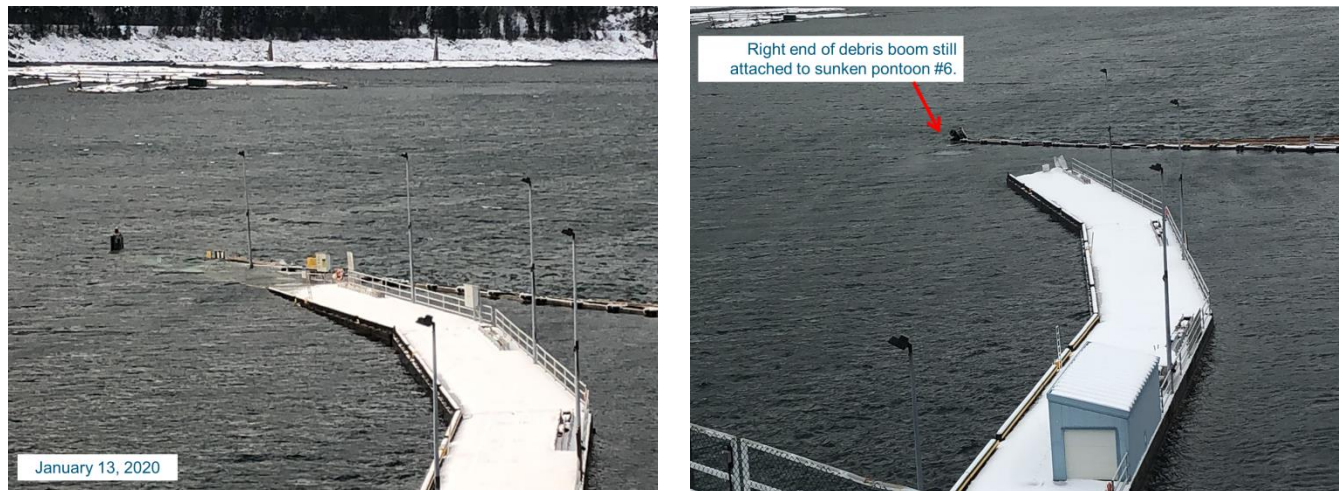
Photo on the left shows Pontoon 6 just below the water. Photo on the right shows the guide wall after Pontoons 5 and 6 had submerged.
